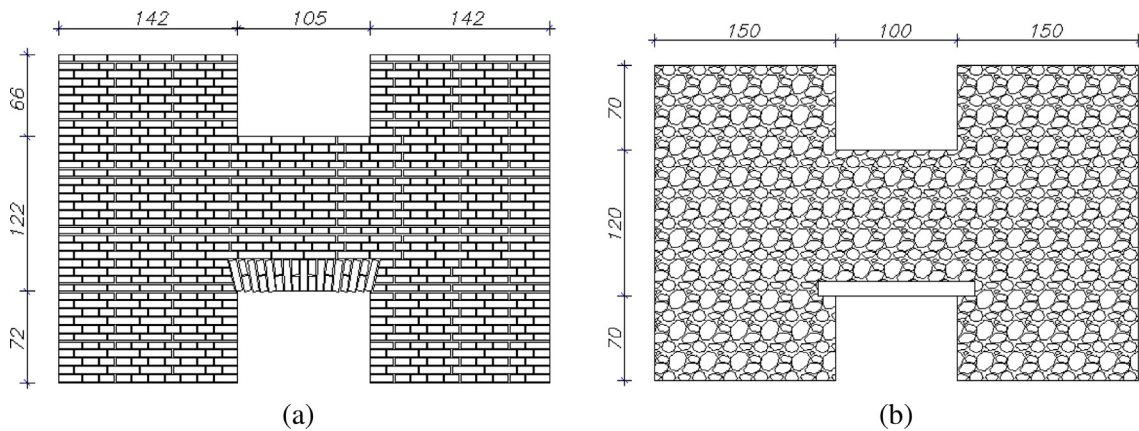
(a) Specimen with a flat arch (MS2); (b) stone specimen (MS4).
